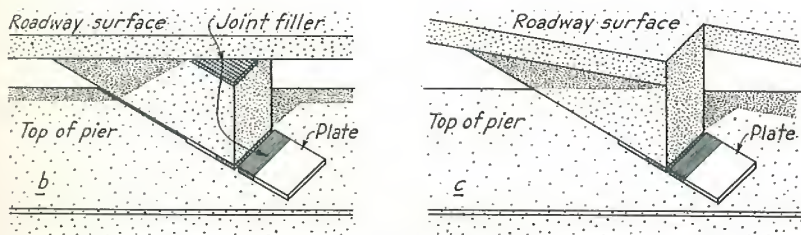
Details suggested for jointing at piers in skew bridges. Type *b* has a straight deck joint, while the joint in the deck is saw-toothed in type *c*.
